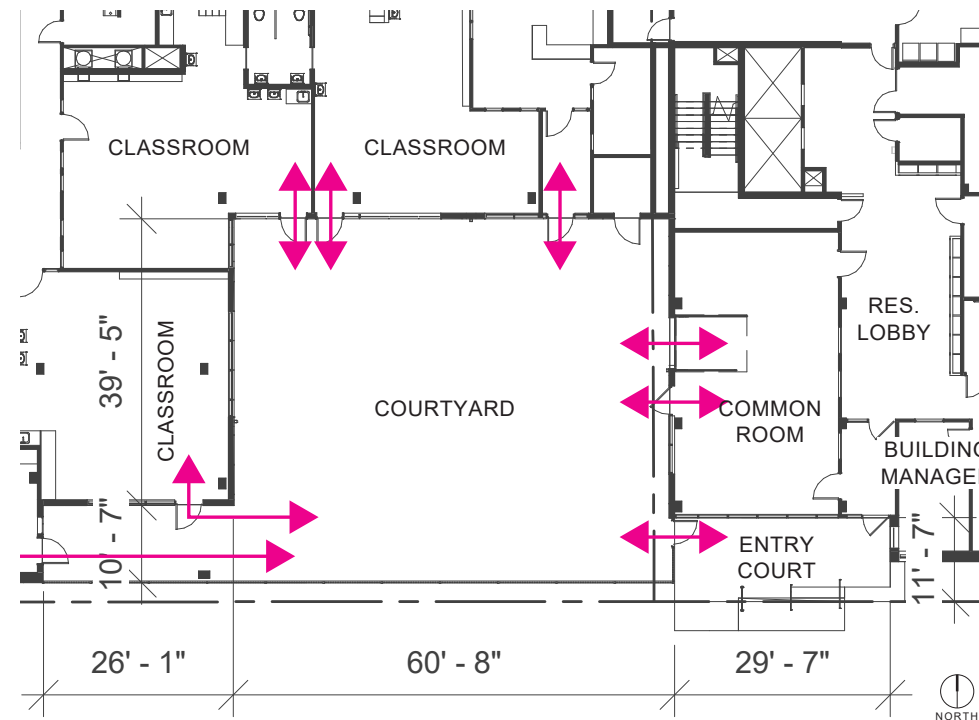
Plan showing courtyard space and points of ingress, all individually controlled for access by building staff.
